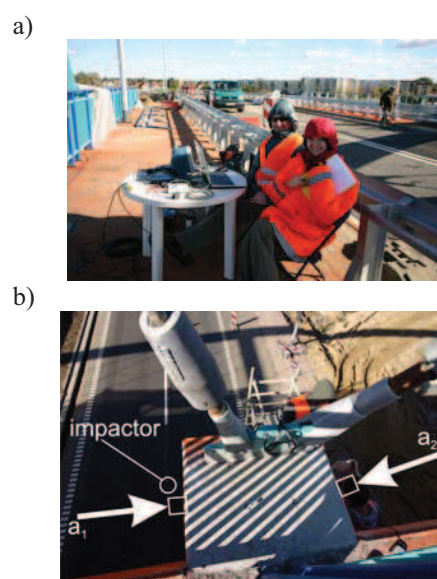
Field tests: a) instrumentation setup; b) cantilever under examination
